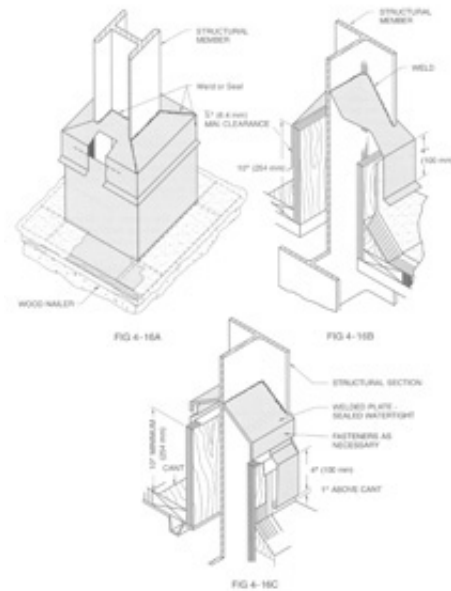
ROOF PENETRATION FLASHING — STRUCTURAL STEEL
